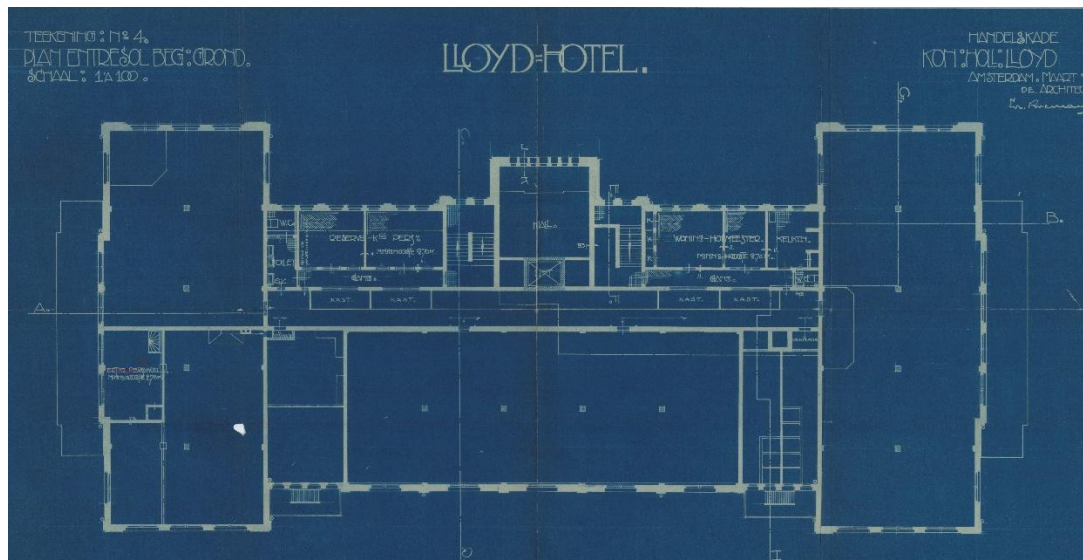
Floorplan ground floor mezzanine Lloyd Hotel (Gemeente Amsterdam Archief; 24527; 10200287, 1917)
